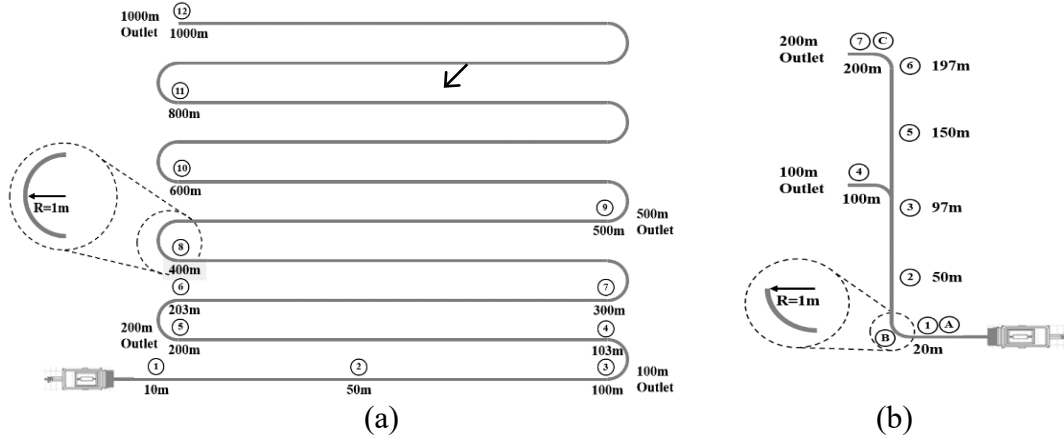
Concrete pumping test: (a) Schematic ground plan of the horizontal pumping circuits and the location of the pressure gauges; (b) Schematic ground plan of the vertical pumping circuits and the location of the pressure gauges
